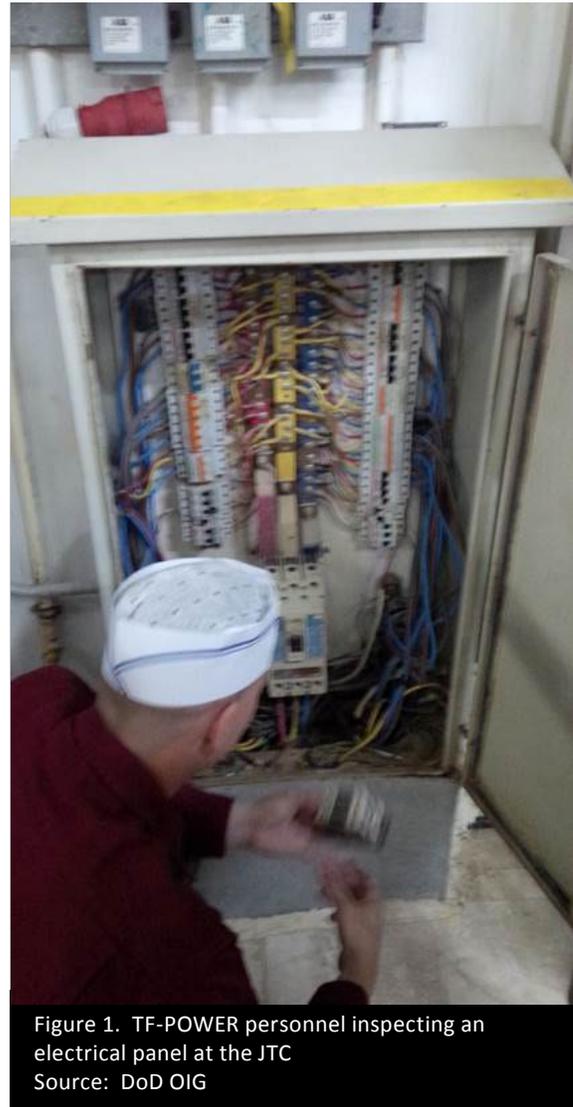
TF-POWER personnel inspecting an electrical panel at the JTC dining facility.
